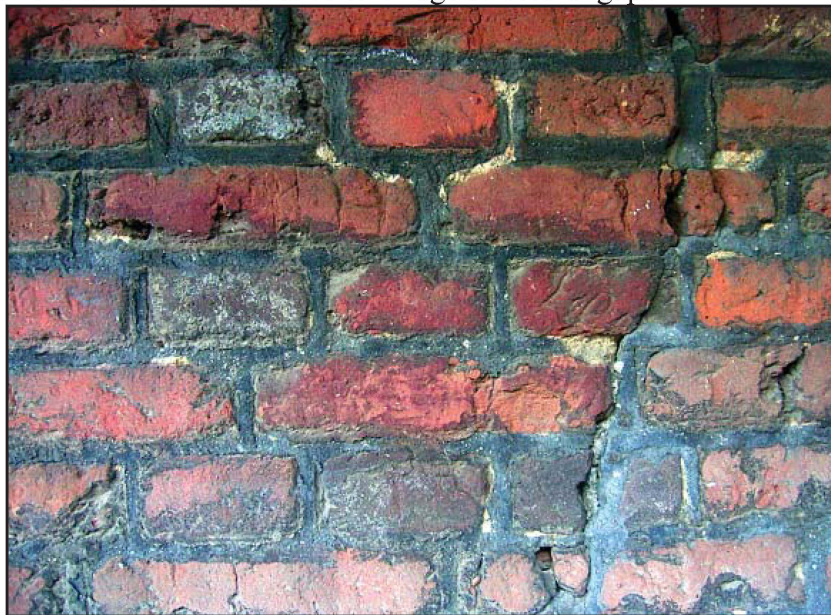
East elevation, ground floor, external view, illustrating red paint on the surface of Tudor bricks (centre of picture)
